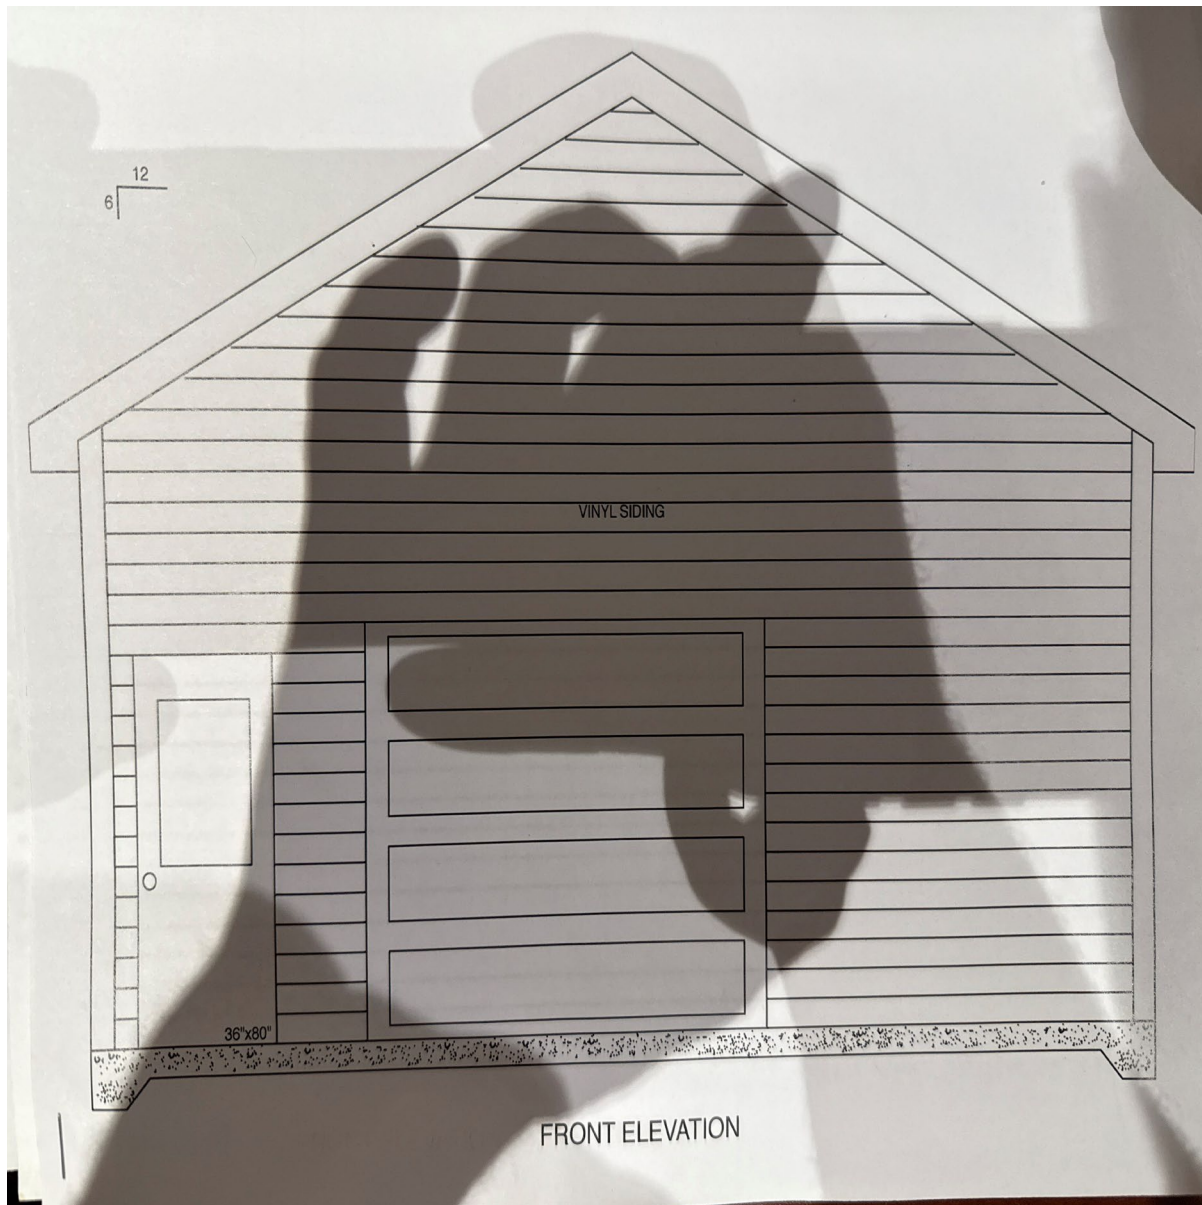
Front elevation of the proposed garage, (c/o Owner).
